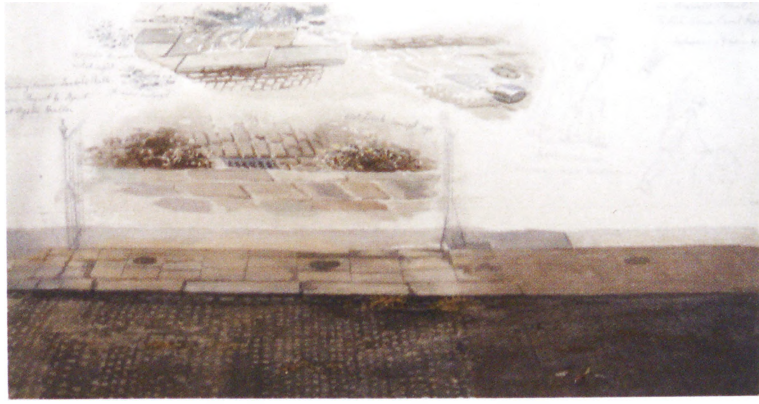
Sketch by George Scharf (BM, Prints and Drawings, British Roy Scharf)
